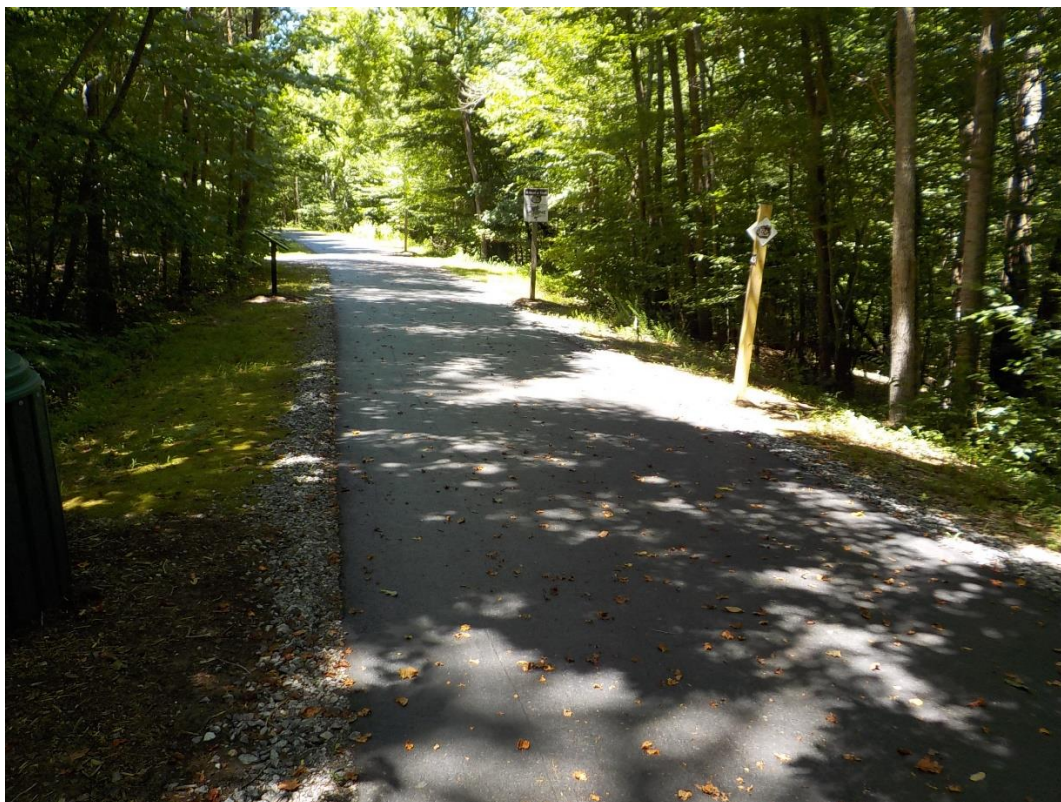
Proposed Mulberry Creek bridge crossing location (view SE)
